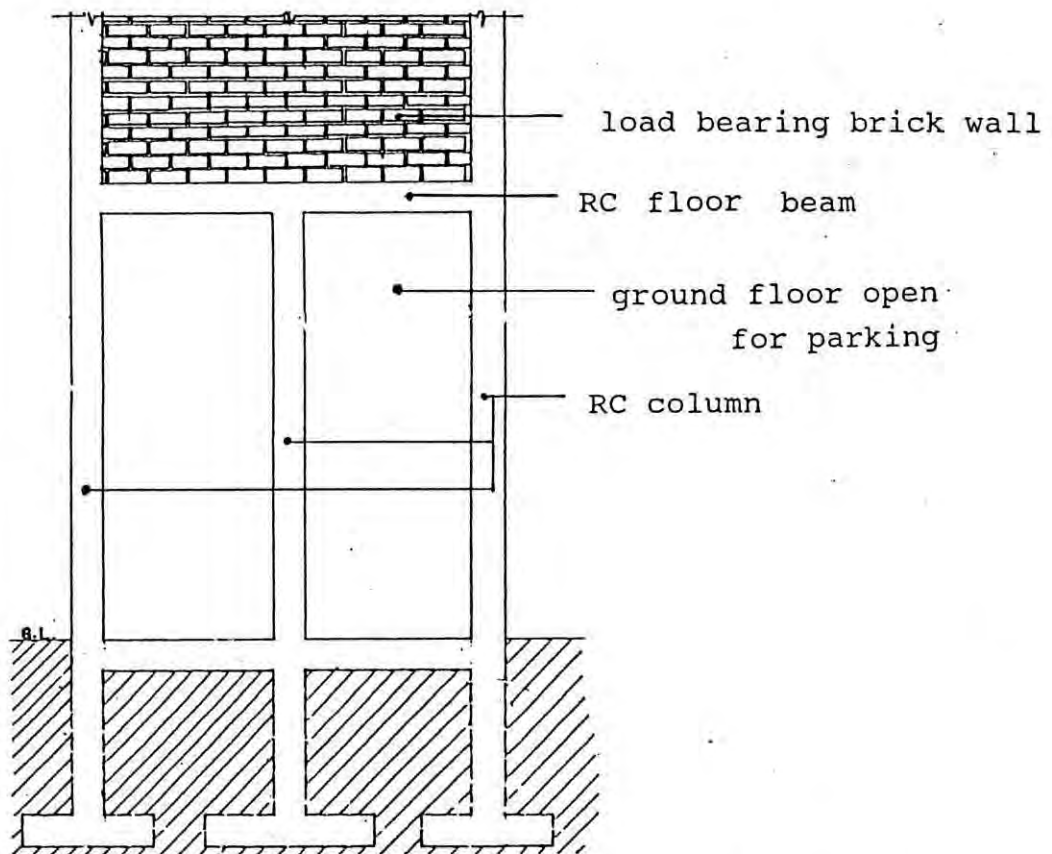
Load Bearing Brick Wall Over Reinforced Concrete Floor Beam
